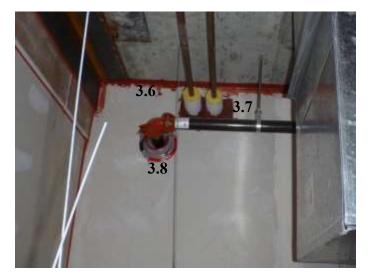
Floor 3 firestops between west side of shaft and EL (EL view)
